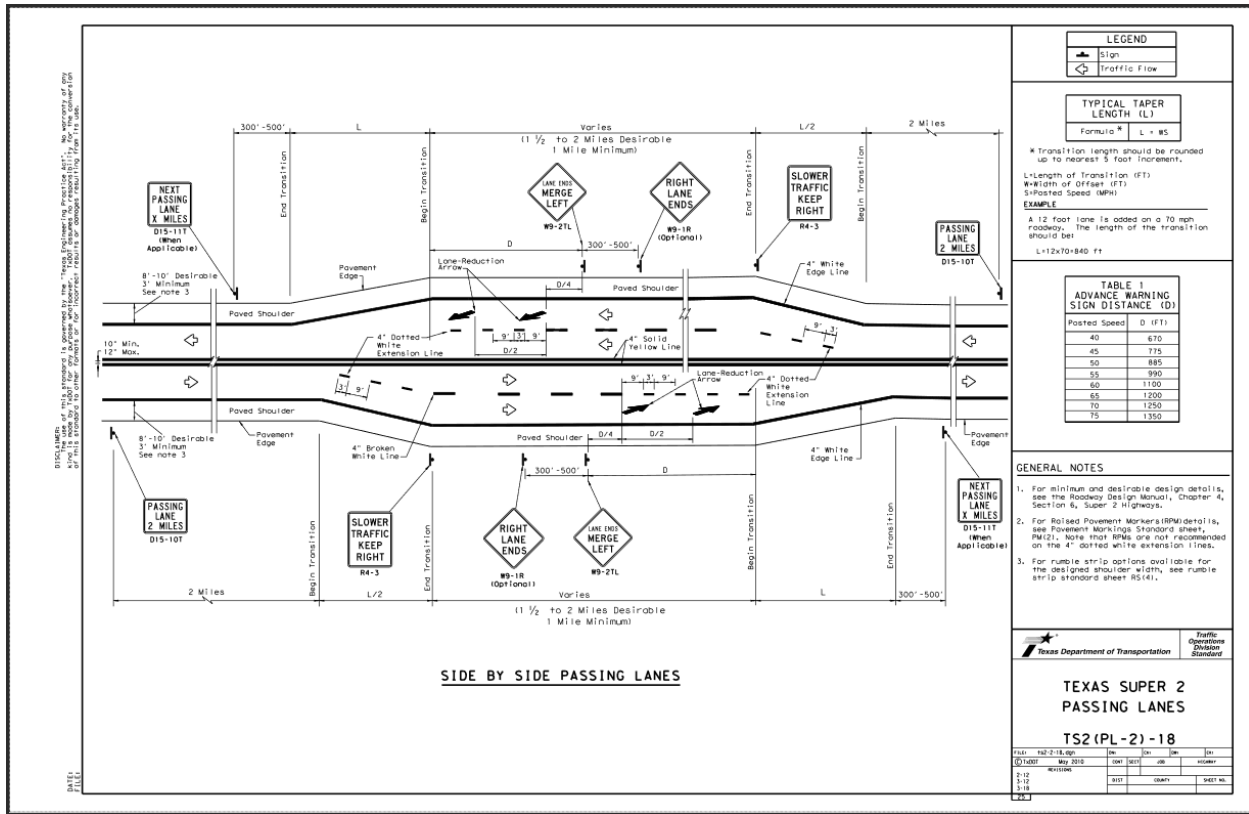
Traffic Standard Sheet TS2-2-18 (13).
